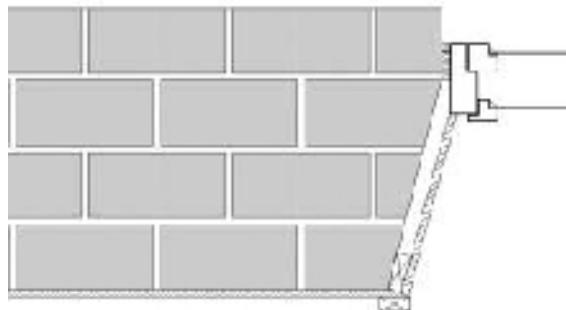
Horizontal section of the joint between the loadbearing exterior wall and the window.
